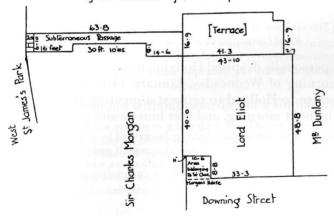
11 Downing Street: Plan Survey of London, XIV, 1931, p. 143
